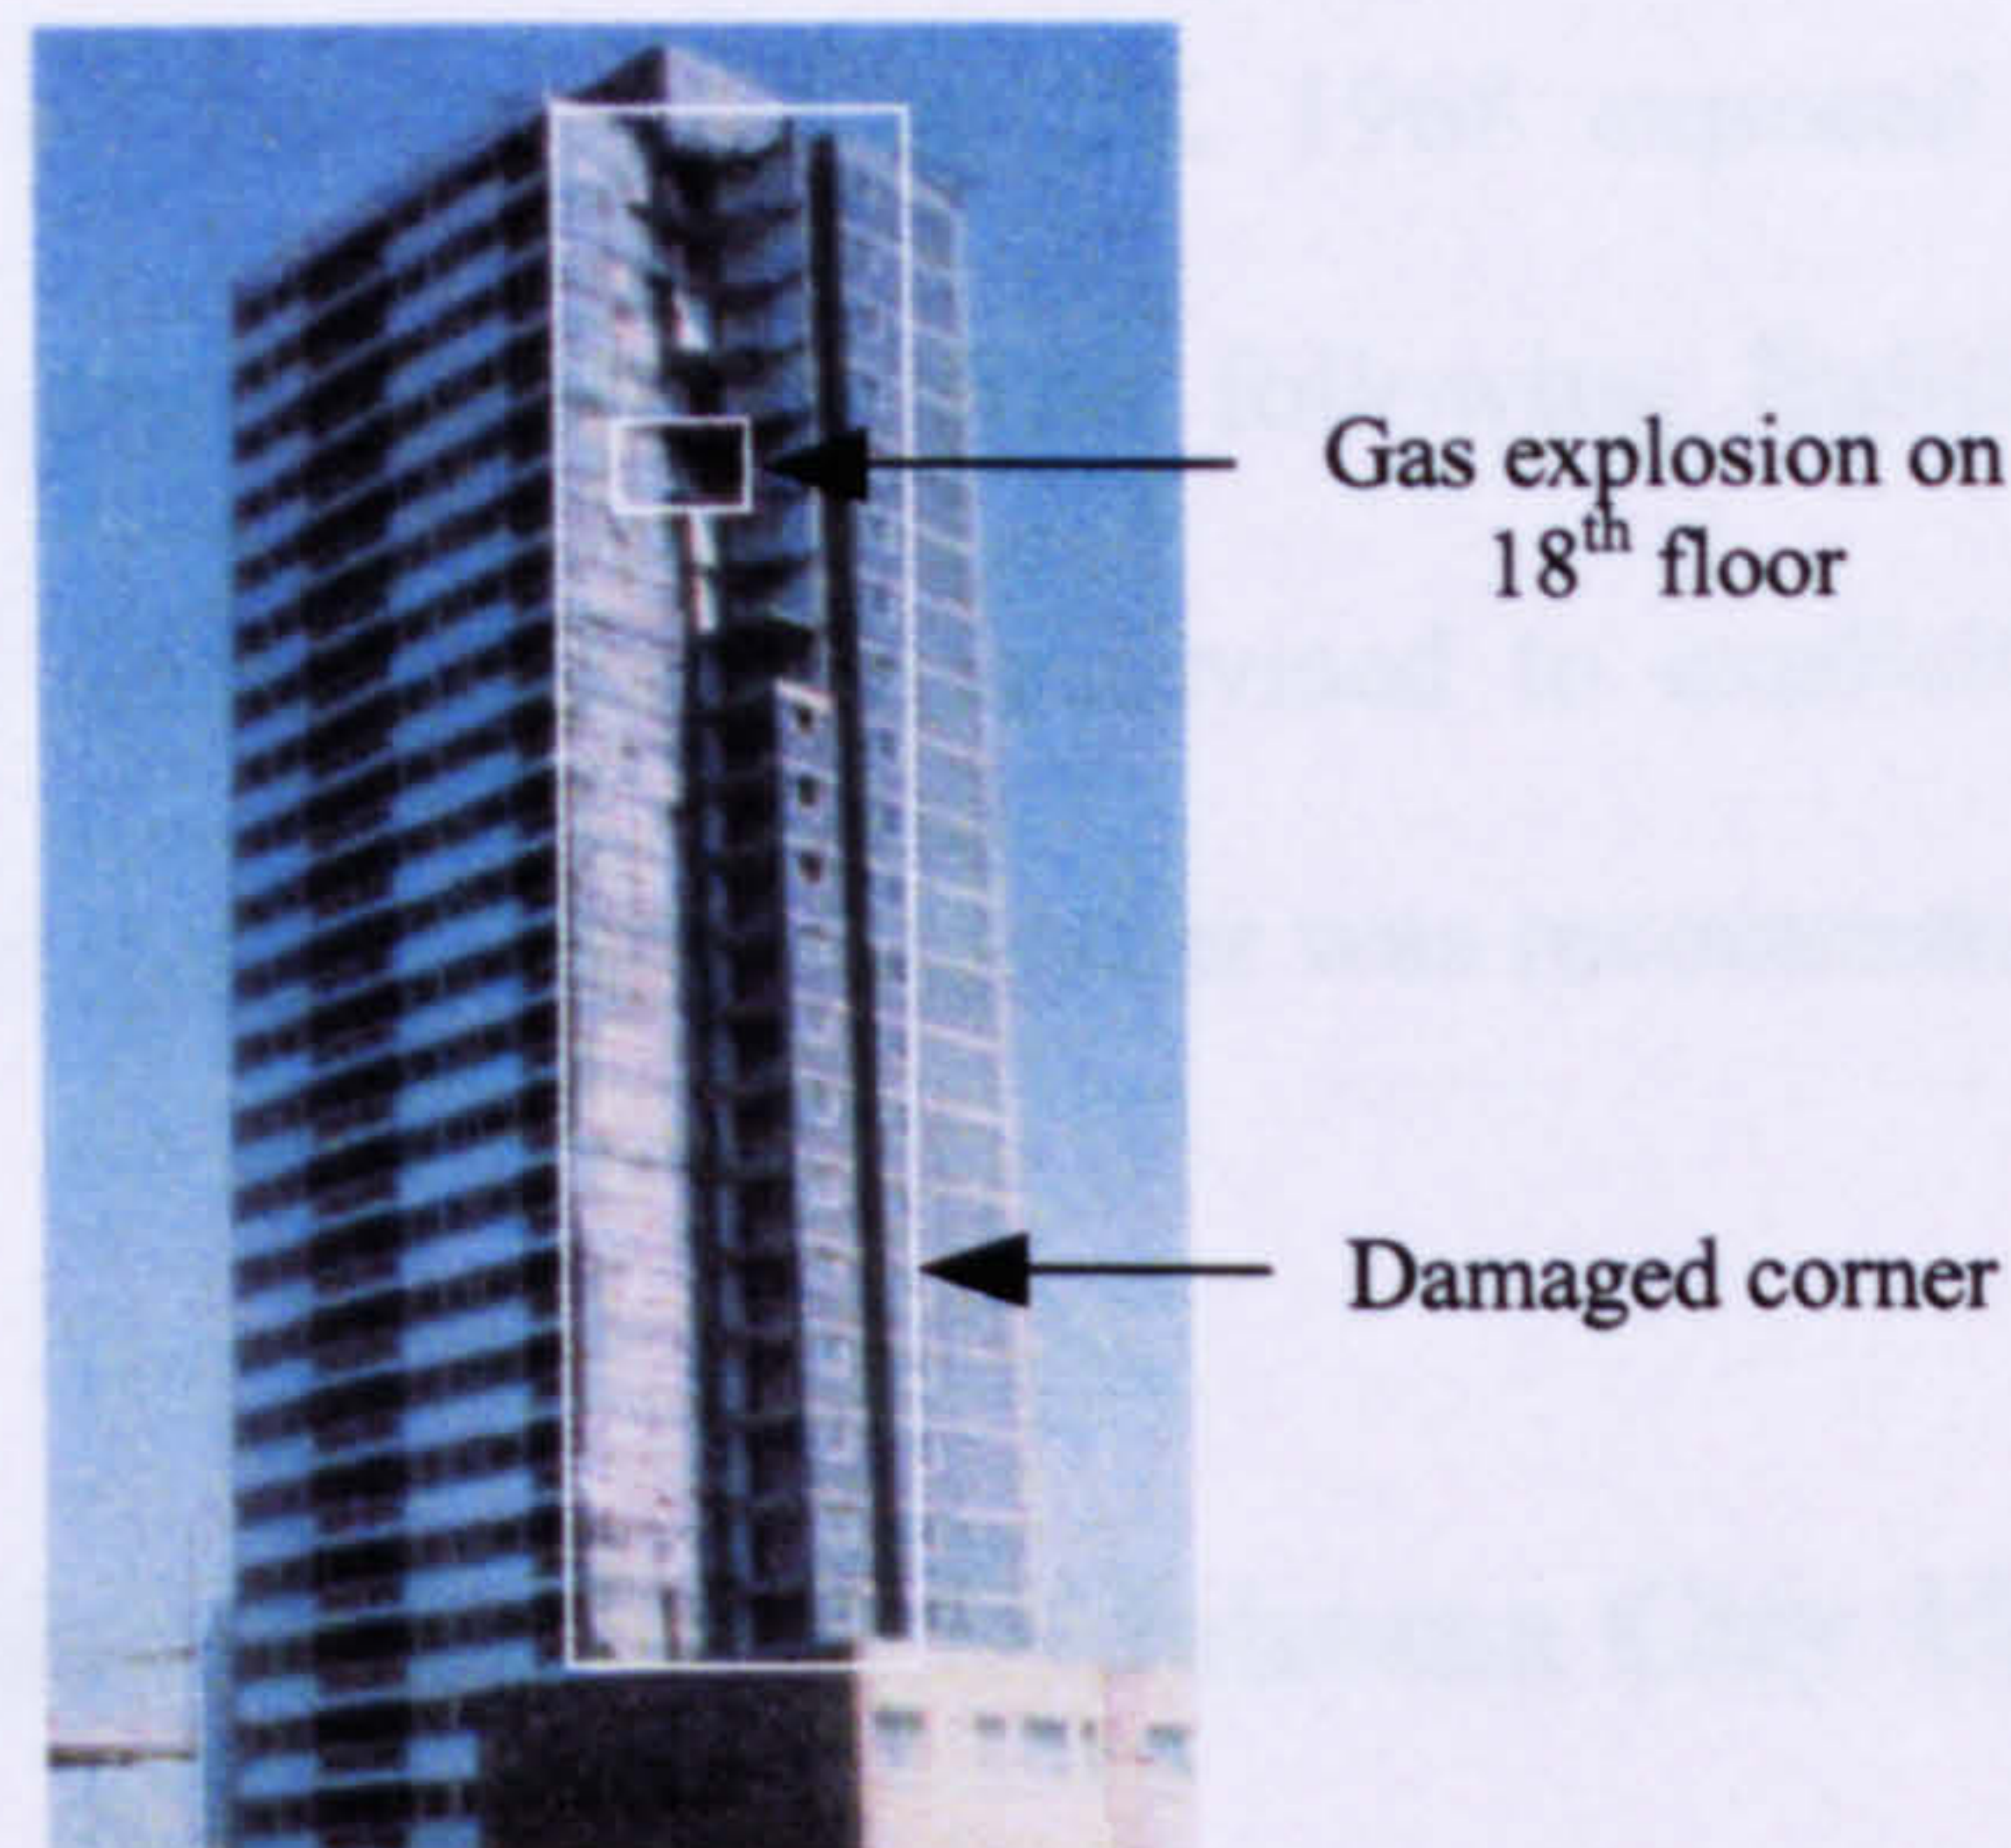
Ronan Point after a gas explosion on the 18th floor
